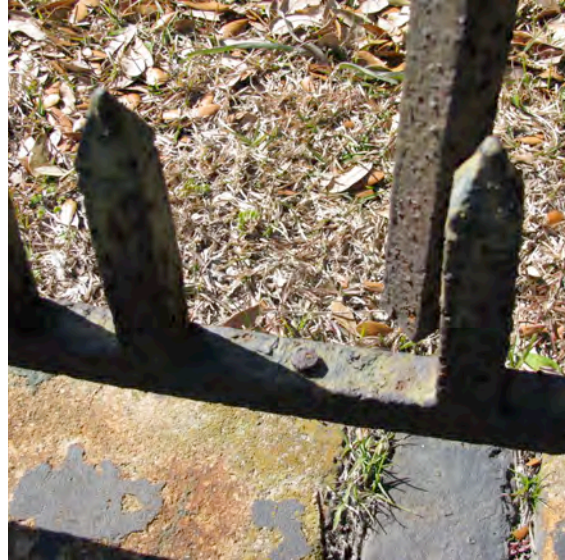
Damage to railing at Bethany Cemetery. Photo by author.
